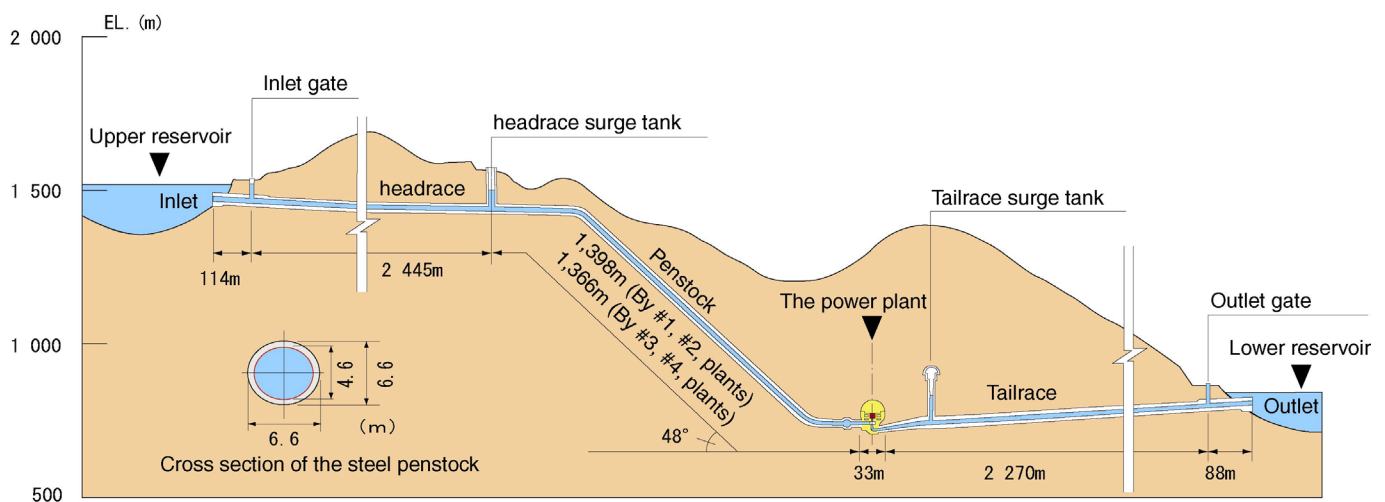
Vertical sectional plan of water tunnels in Kannagawa power plant
